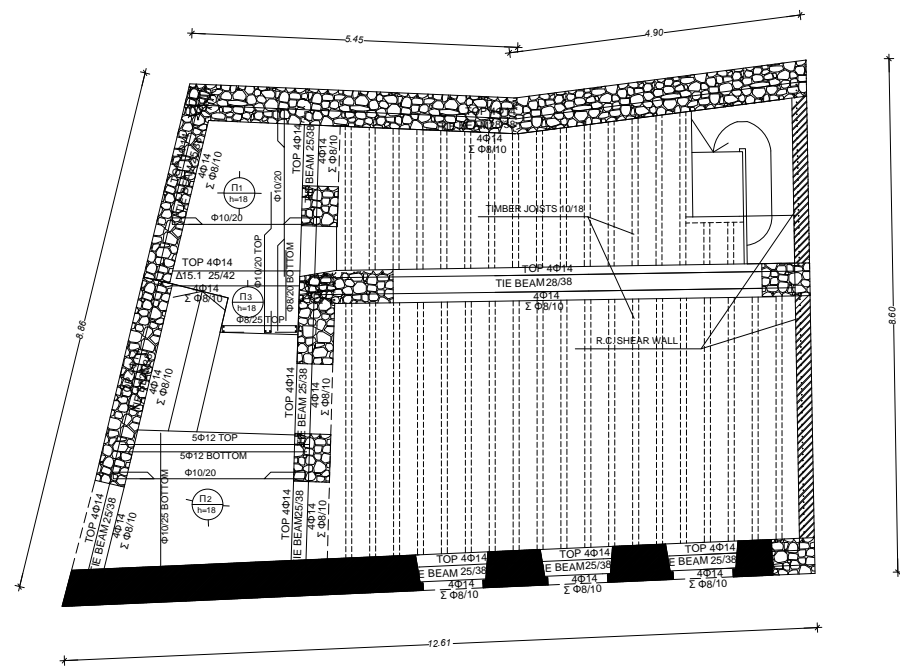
Steel reinforcement of members at the ground floor (reflected ceiling) level.
